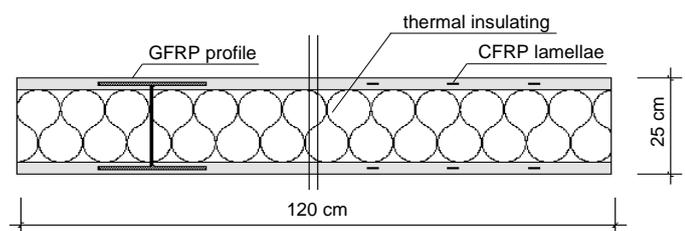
Concept of a thermally insulated UHPC sandwich element.
